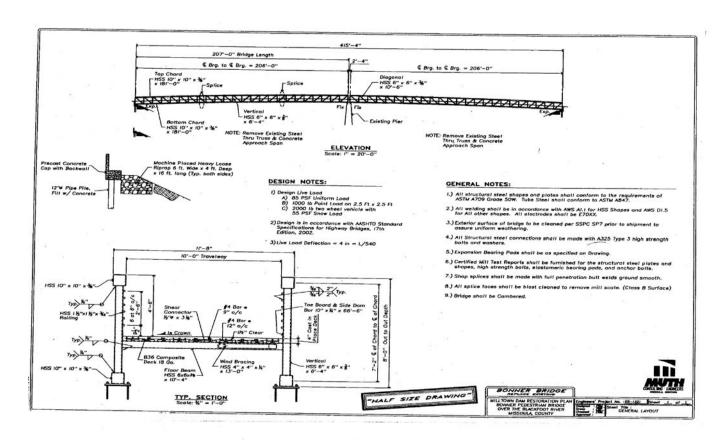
Two Span Pre Fabricated Pedestrian Bridge
